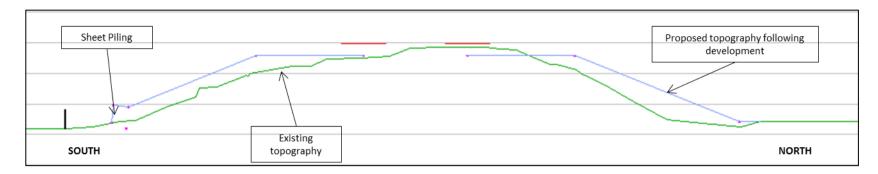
Typical Design Cross Section at MOD West (Mainline) showing the proposed berm widening on the northern side, and change in topography using gabion walling on the southern side.
